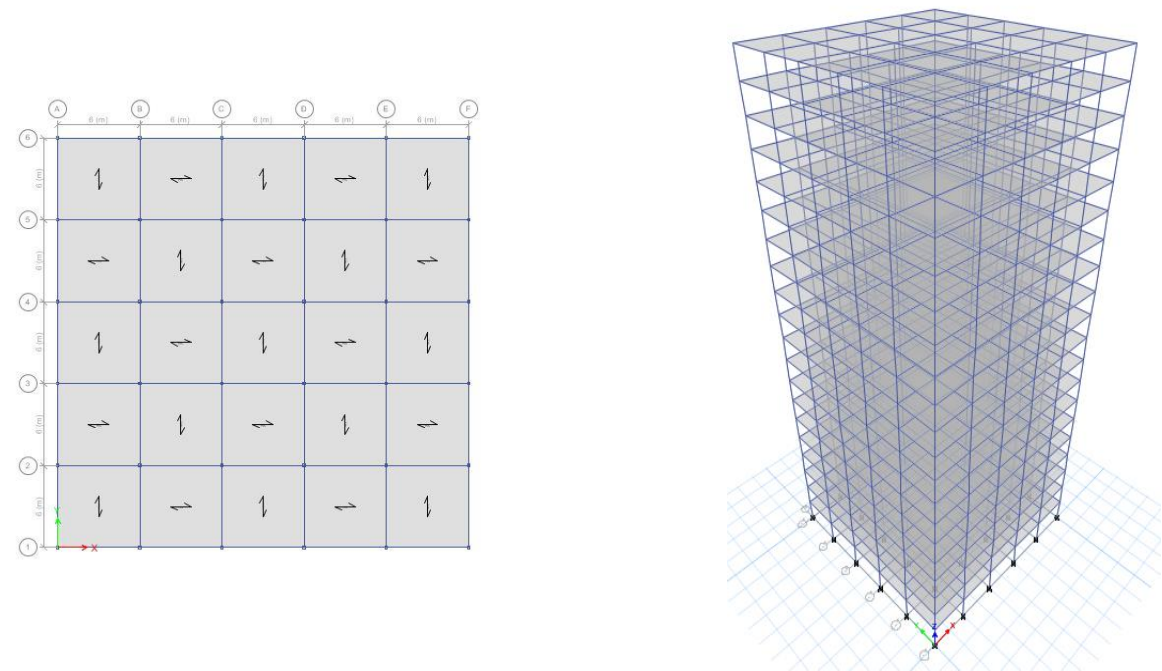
Three-dimensional view and floor plan of the 20-story building frame.
